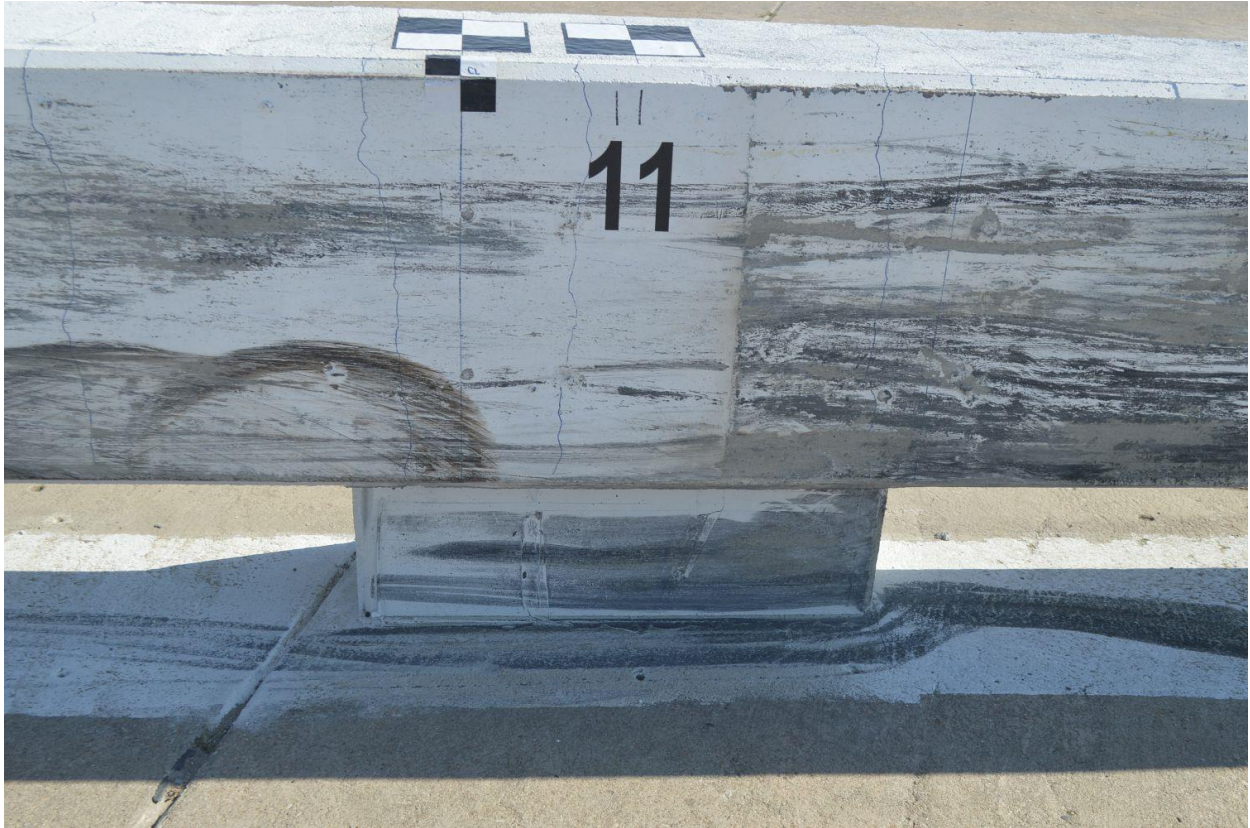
Concrete Beam Damage near Post No. 11, Test No. OCBR-1
